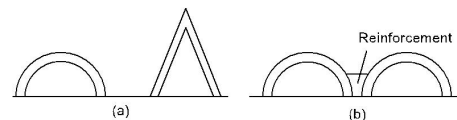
(A) Individual roof units, (b) combined roof unit
